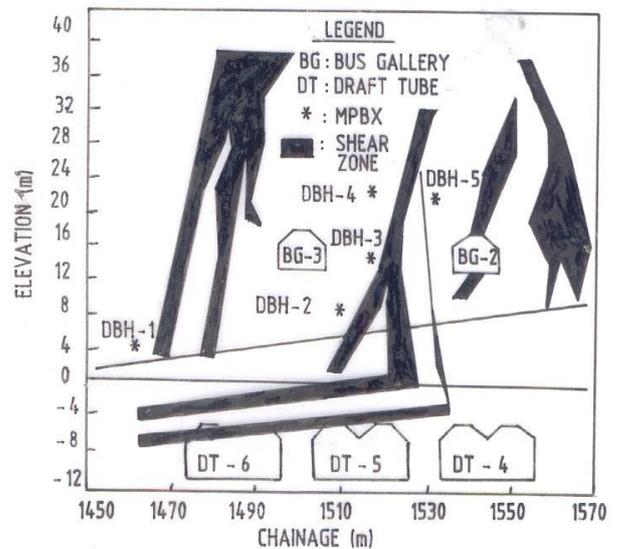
Instrumentation on upstream wall of powerhouse cavern along with shear zone
